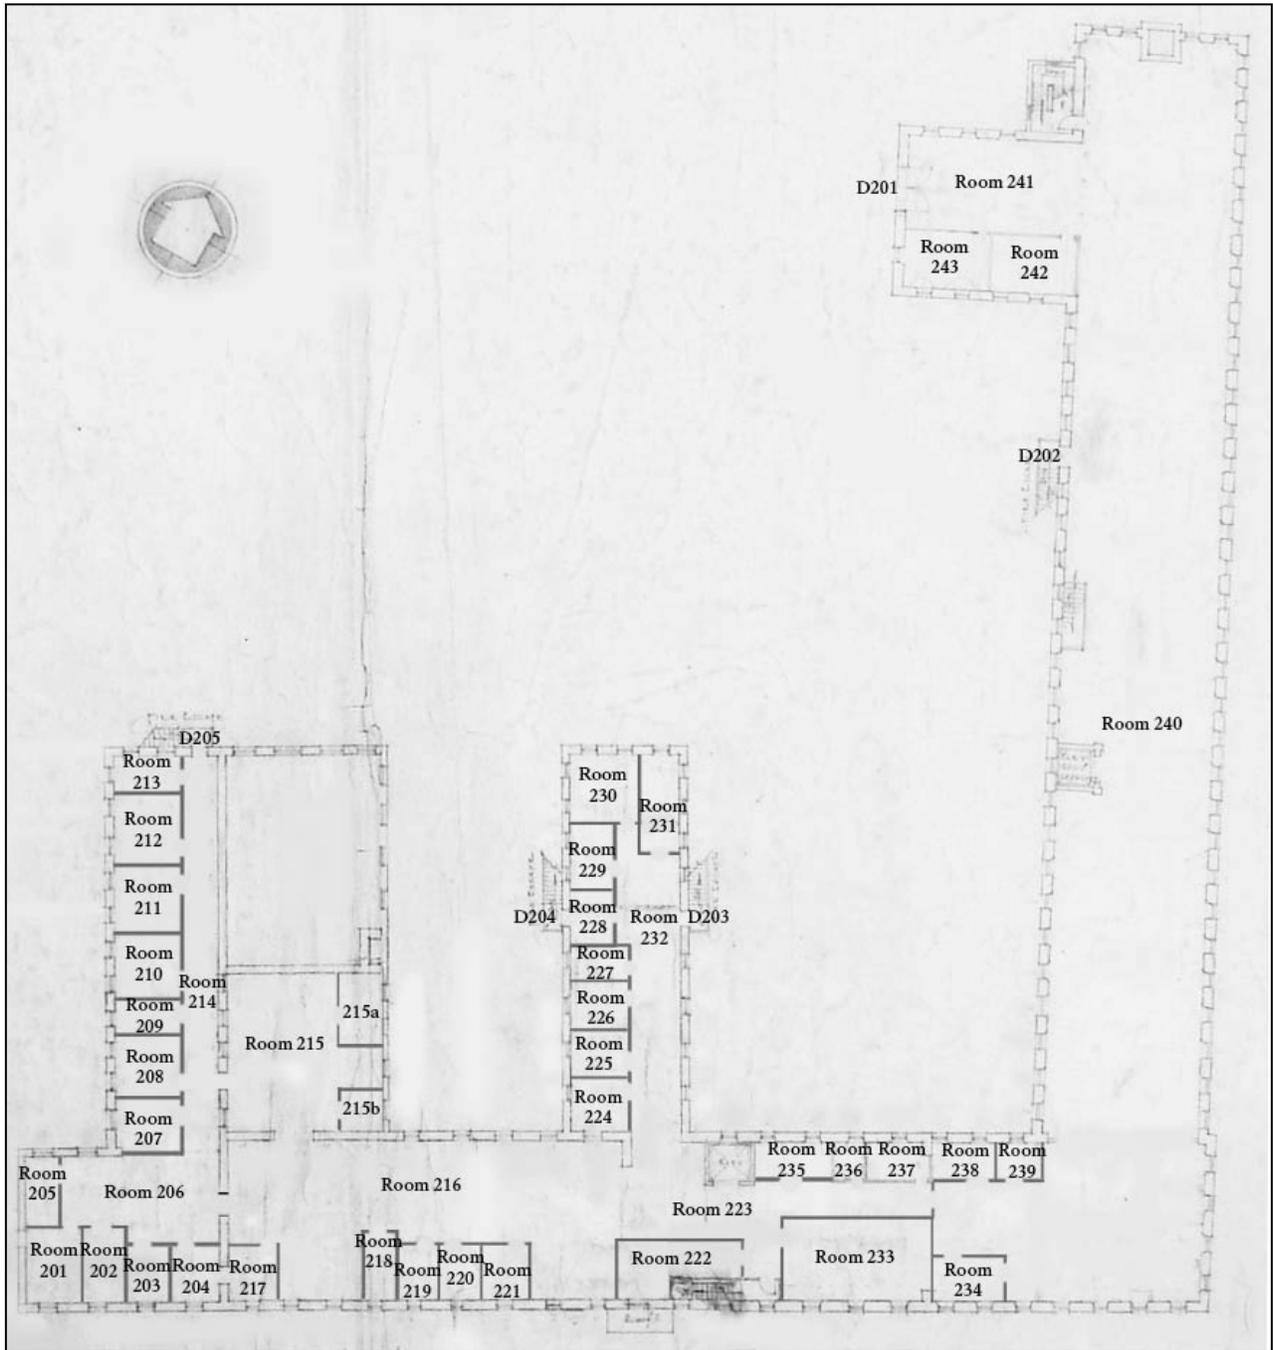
Building 27 second floor plan, with room numbers assigned for current project. Plan copied from 1941 drawing (fig. 55) with more recent partitions added; not to scale.
